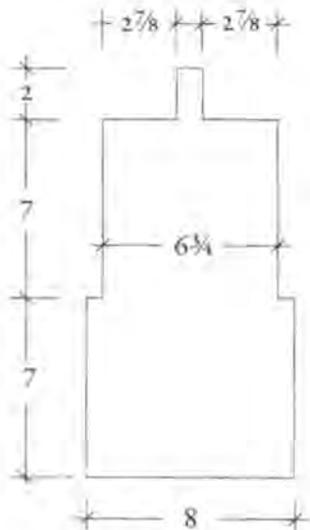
NET SECTION OF SUMMER BEAM AFTER HOUSING AND NOTCHING FOR JOIST.
